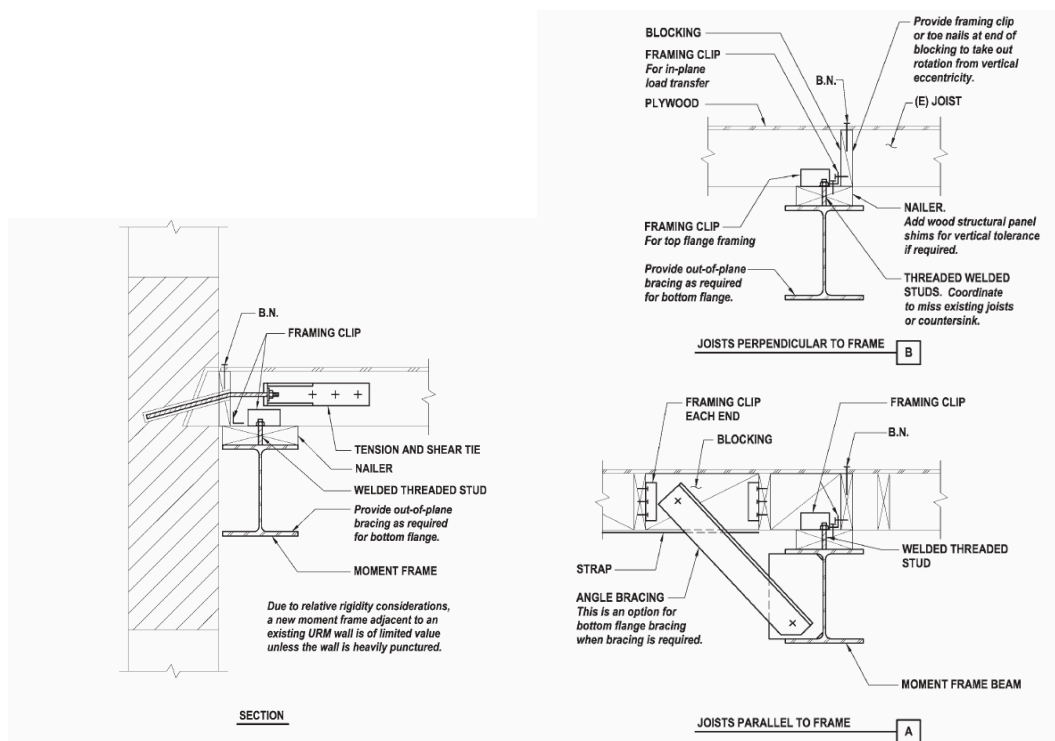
New Perimeter Steel Moment Frame to an Existing Wood Floor Figure 21.4.9-2: New Interior Steel Moment Frame to an Existing Wood Floor
